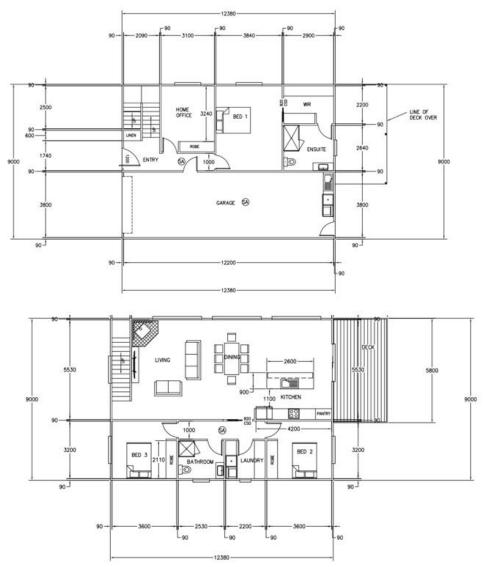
Proposed floor Plan (Source: Application Documents submitted with DA 2023/0184)
